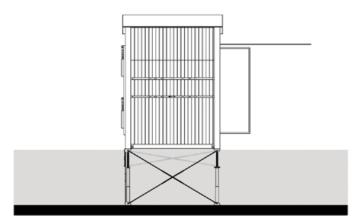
33. South elevation with 1500mm high foundations at 1:100
